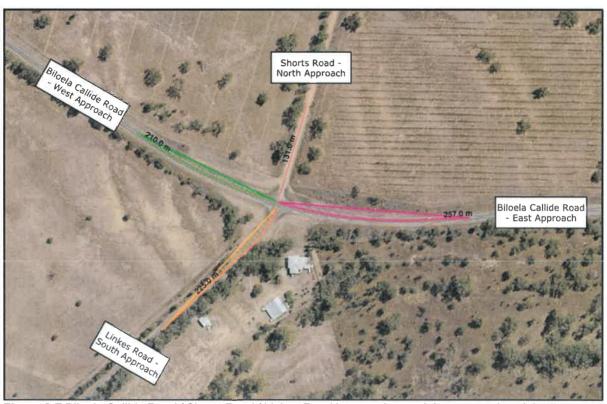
Biloela Callide Road / Shorts Road / Linkes Road intersection – minimum stopping sight distances
